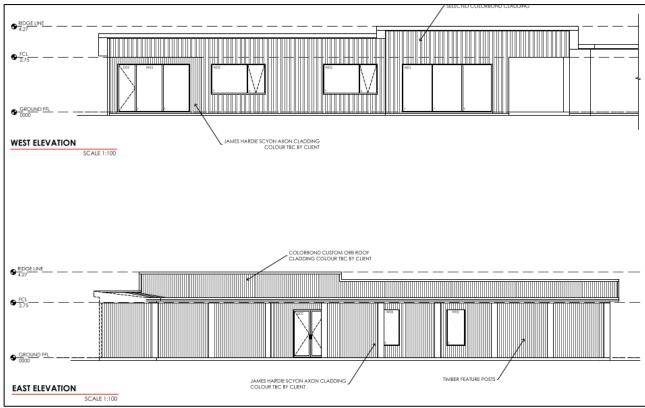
Facilities Building #2 - Western and Eastern elevations (Source: RFS Projects)
